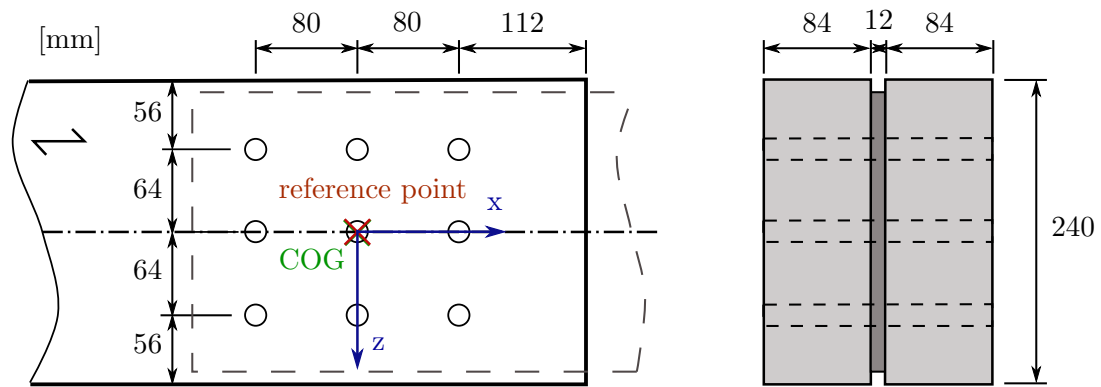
Elevation (left) and cross section (right) of a centric dowel connection.
